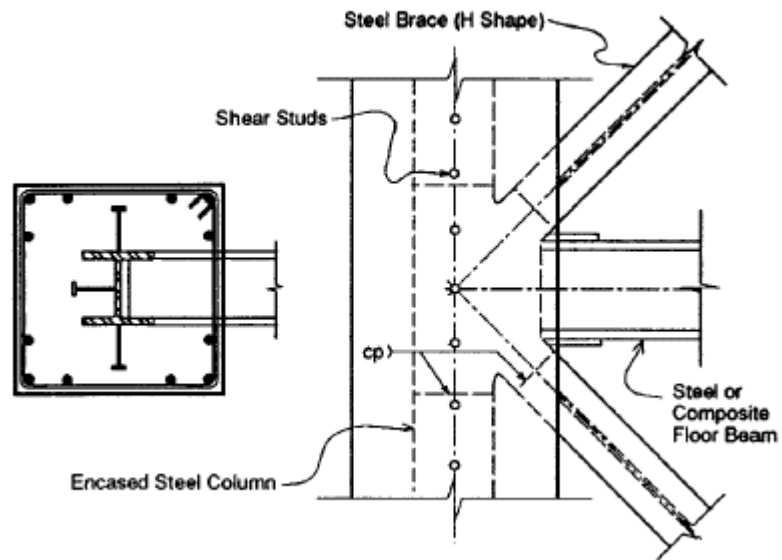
Reinforced concrete (or composite) column-to-steel concentric brace.
